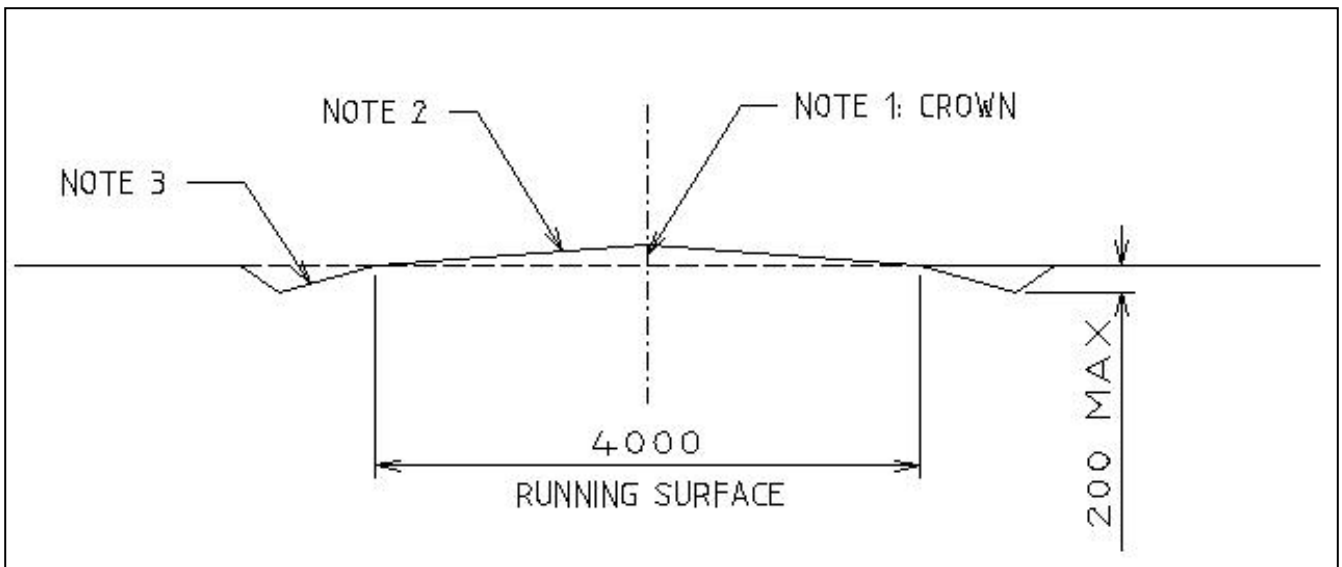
Plan Track View for Stable Access Track Drainage
